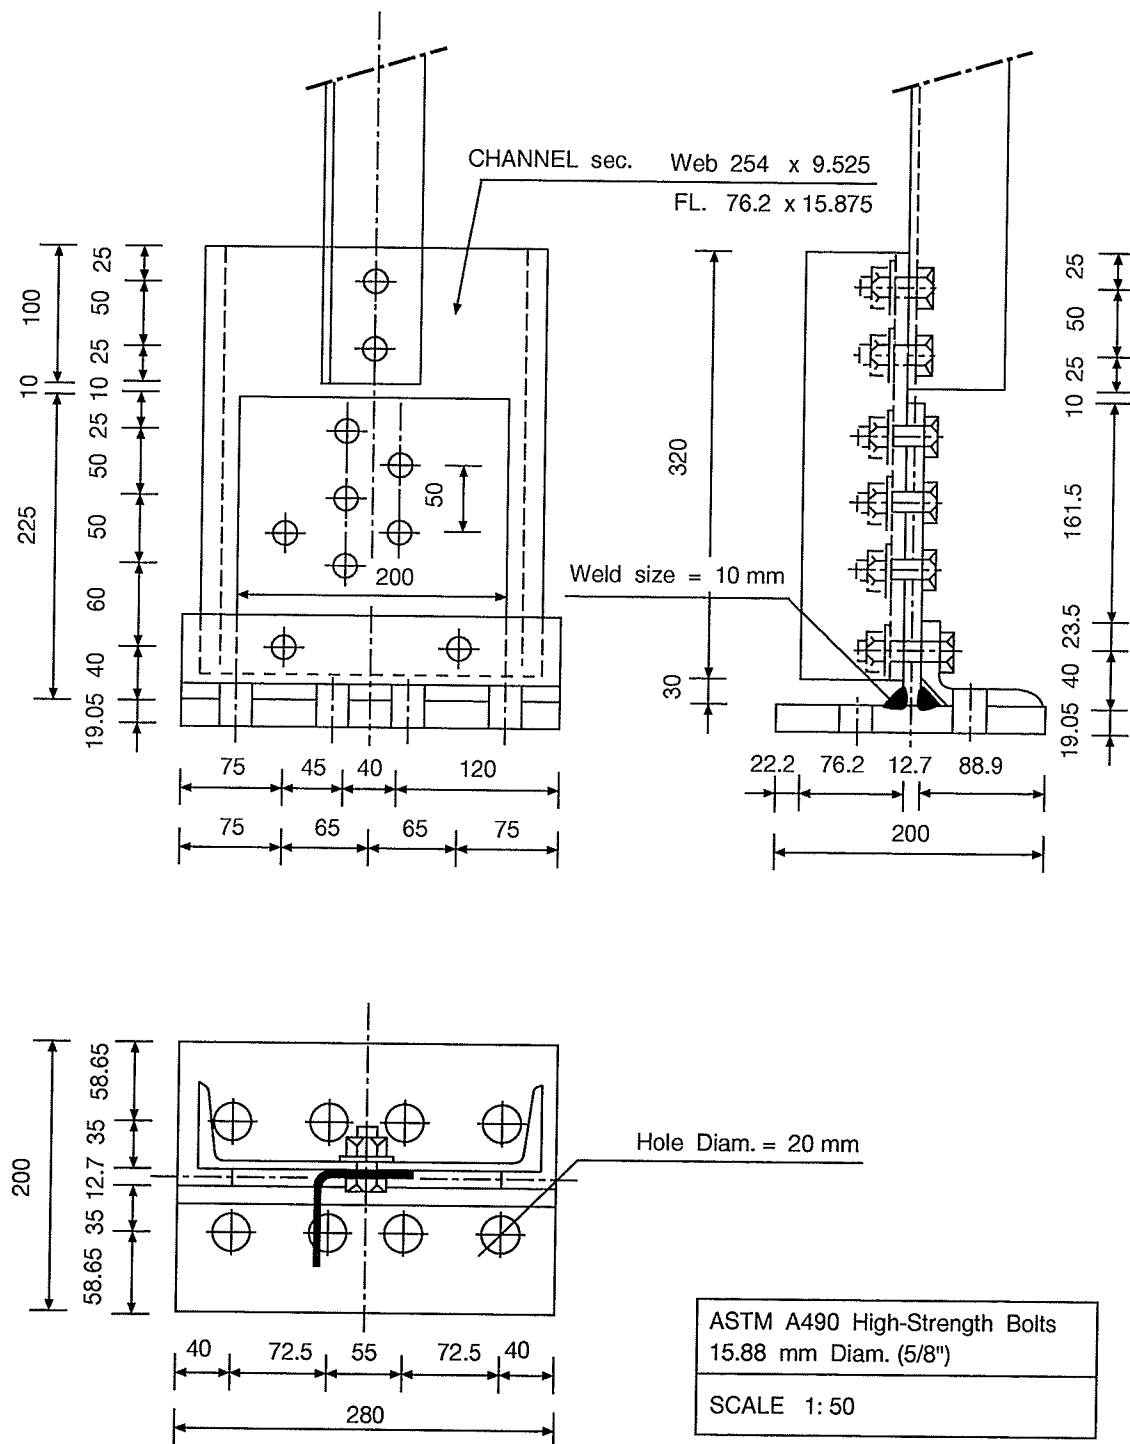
Connection Type "A" Used with Test Setup # 1.
